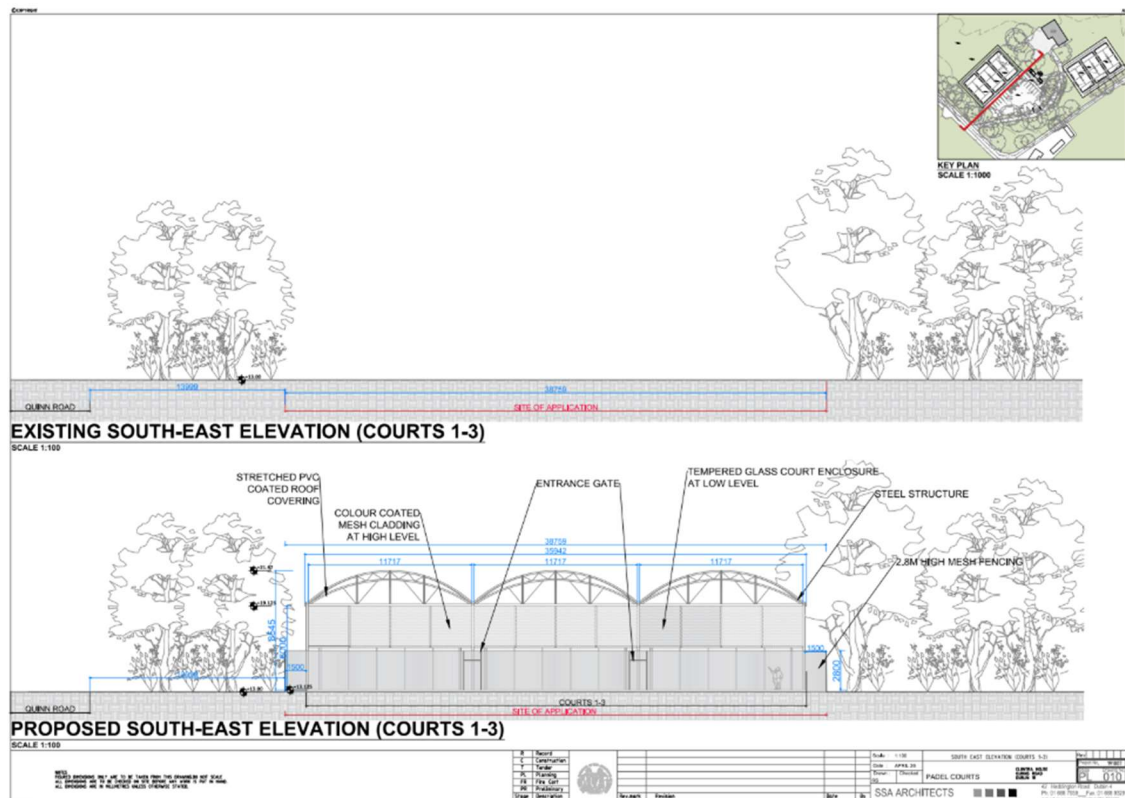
Existing and proposed South-East Elevation for Courts 1-3
